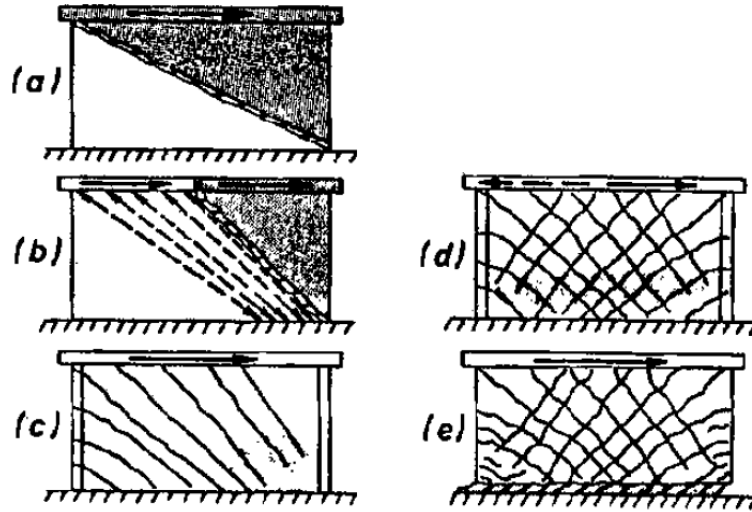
Shear failure modes in squat walls (Paulay and Priestley, 1992)
